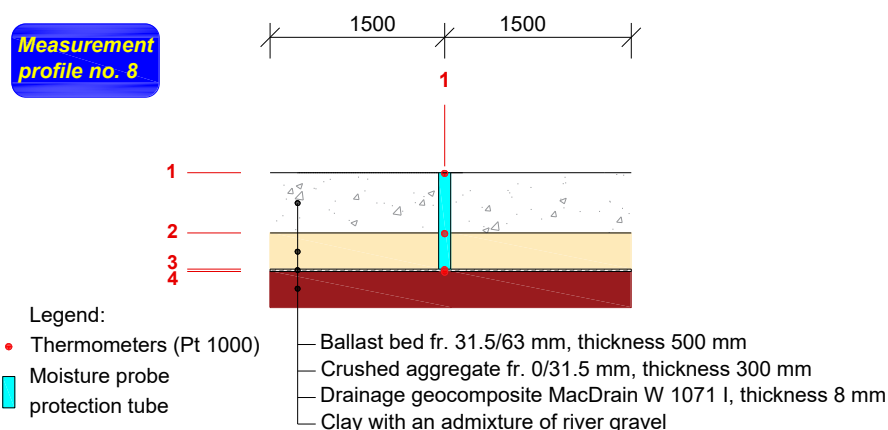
Measurement profile no. 8 with built-in drainage geocomposite – structural composition.
